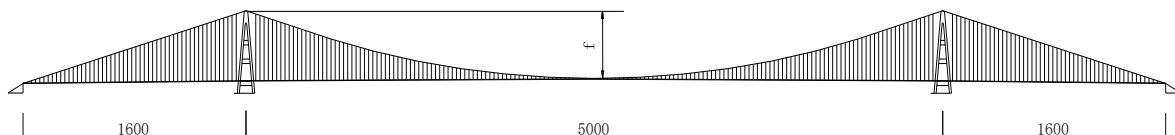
Span arrangement of Taiwan Strait Bridge (Unit: m)
